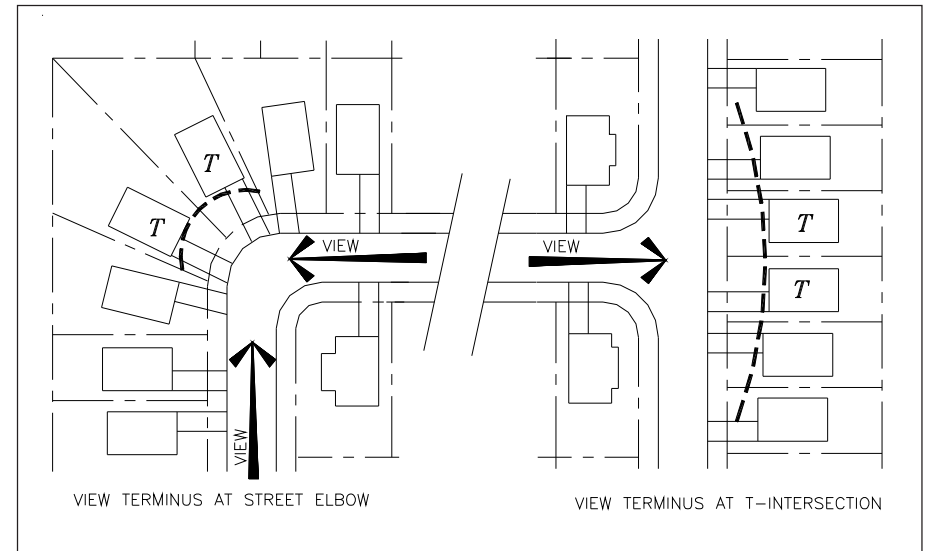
Conceptual plan view of view terminus dwellings
